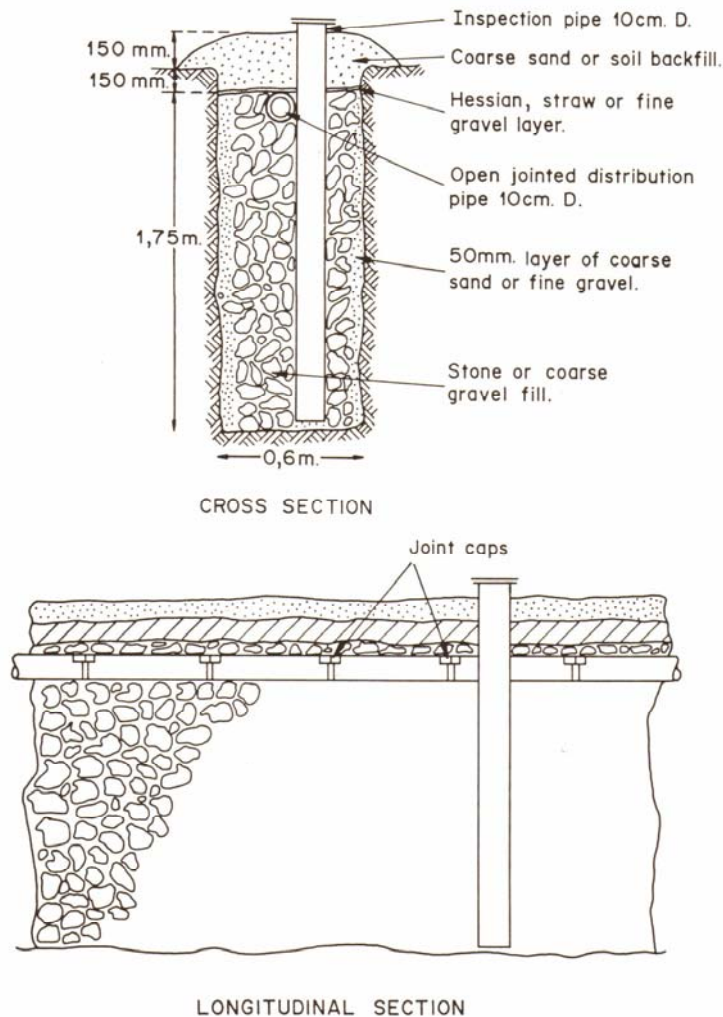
Details of Trench Construction (source: CSIR Technical Guide K86, 1985).
